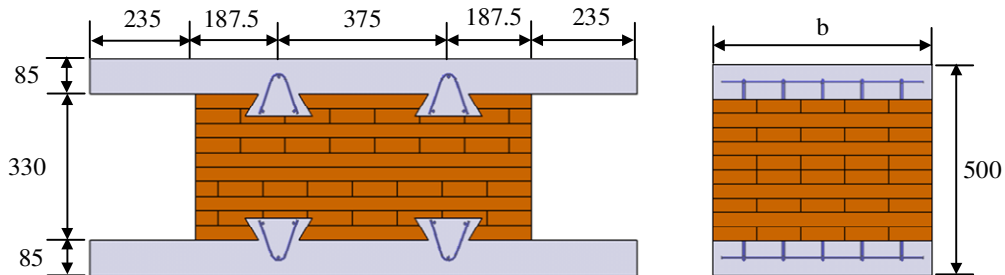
Pushout test: Dimension of the specimen (dimensions in mm).
